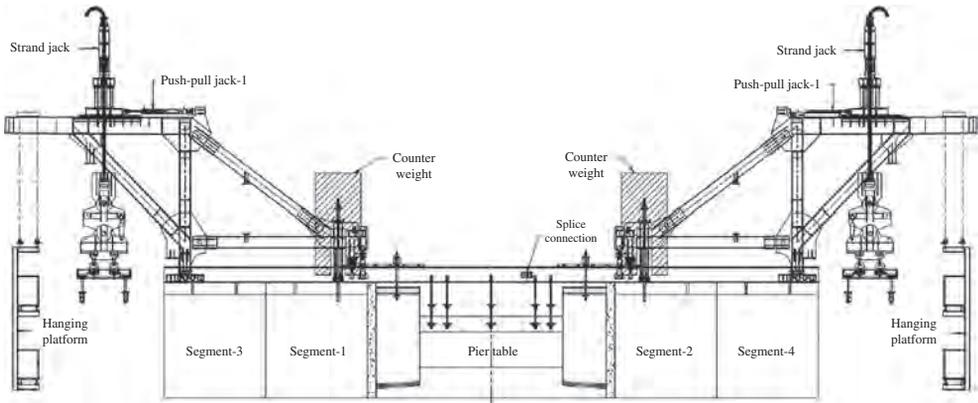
Bridge Builder frames are shifted forward and tied down with segment 1 and 2 respectively
